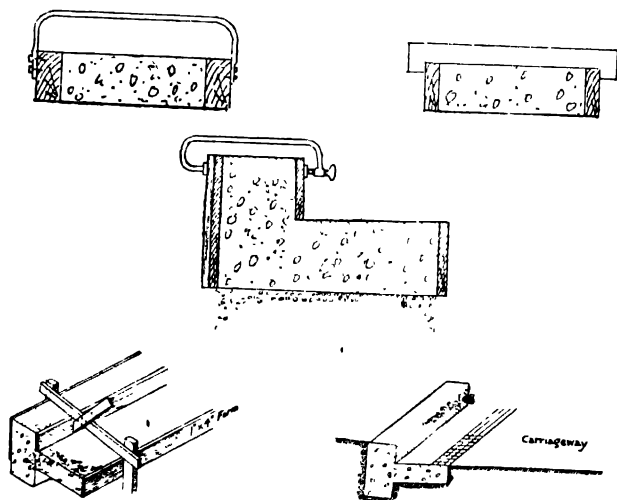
Methods of Construction of combined Concrete Kerb and Channel in situ.
